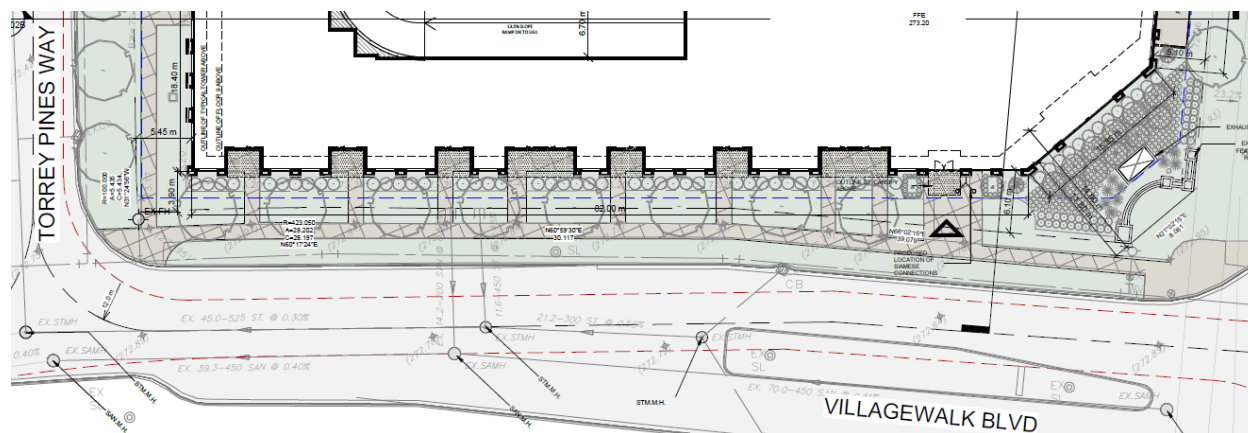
Street-oriented patio spaces with individual walkways to the street at 30 Villagewalk Boulevard
